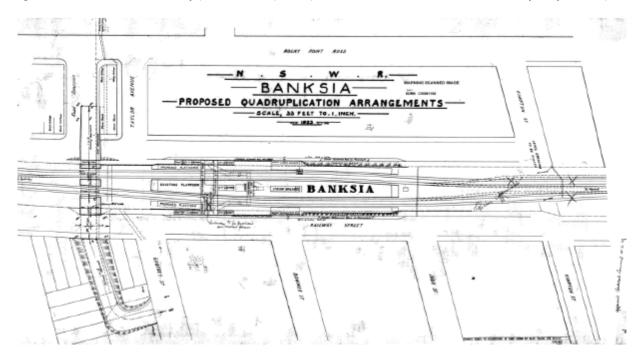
Banksia Station proposed quadruplication arrangements, c.1923 (Source: Sydney Trains plan room)
